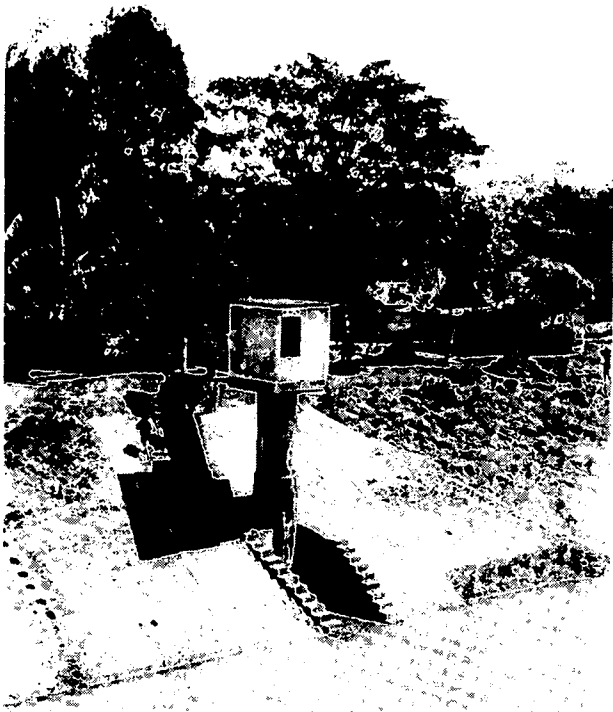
Water level recorder station; stilling well made of heavy concrete pipe, house made of plastered brick, bank-protection made of masonry (Cimanuk River at Djatibarang, Java, Indonesia).
